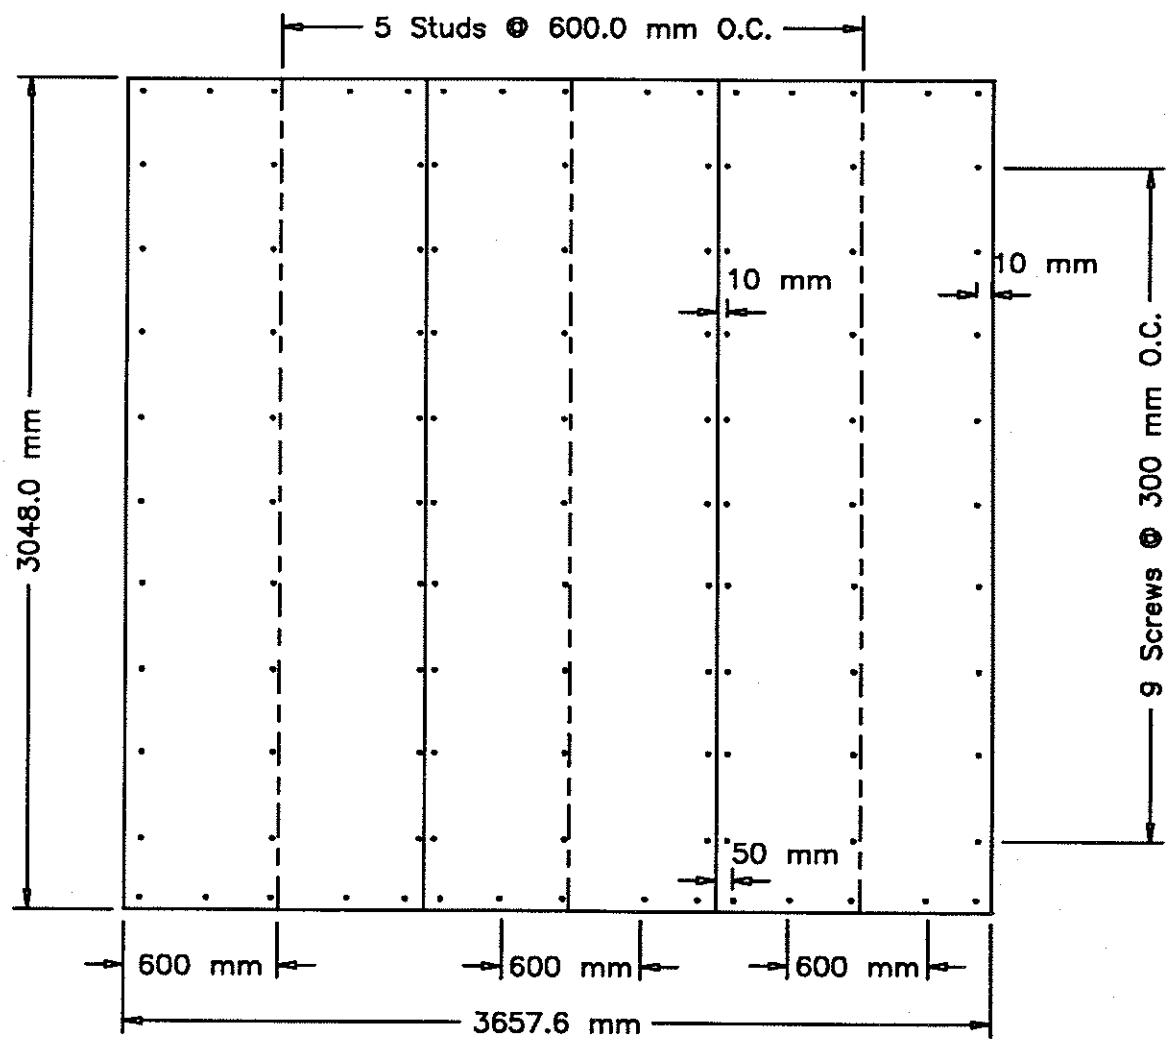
Screw Locations For Steel Stud, 1x2 Gypsum Board Layers, Full-Scale Assembly, Unexposed Face
